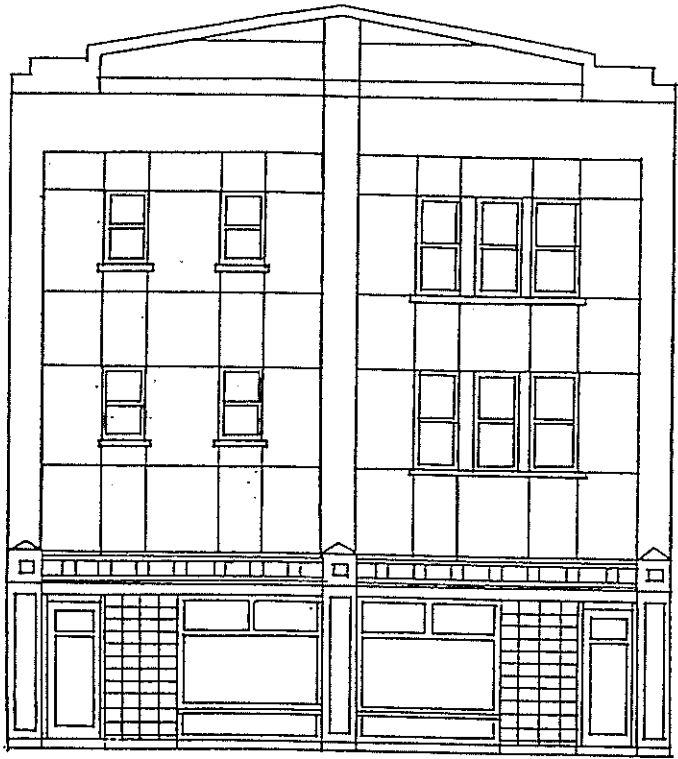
Buildings in the core should not exceed 3 storeys in height and incorporate traditional pioneer details.
